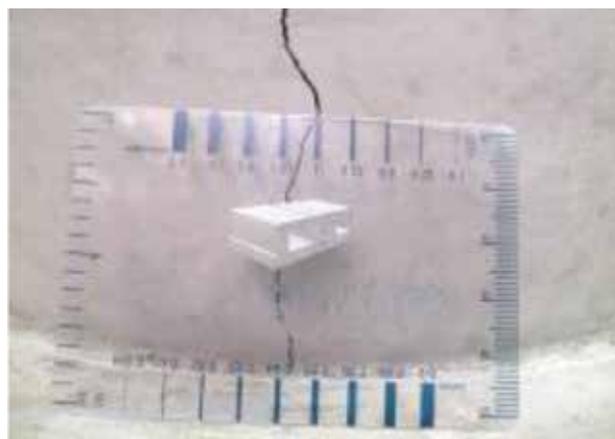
Typical crack width of 0.04 in. (1 mm) in untreated or SRA-treated concrete specimens
